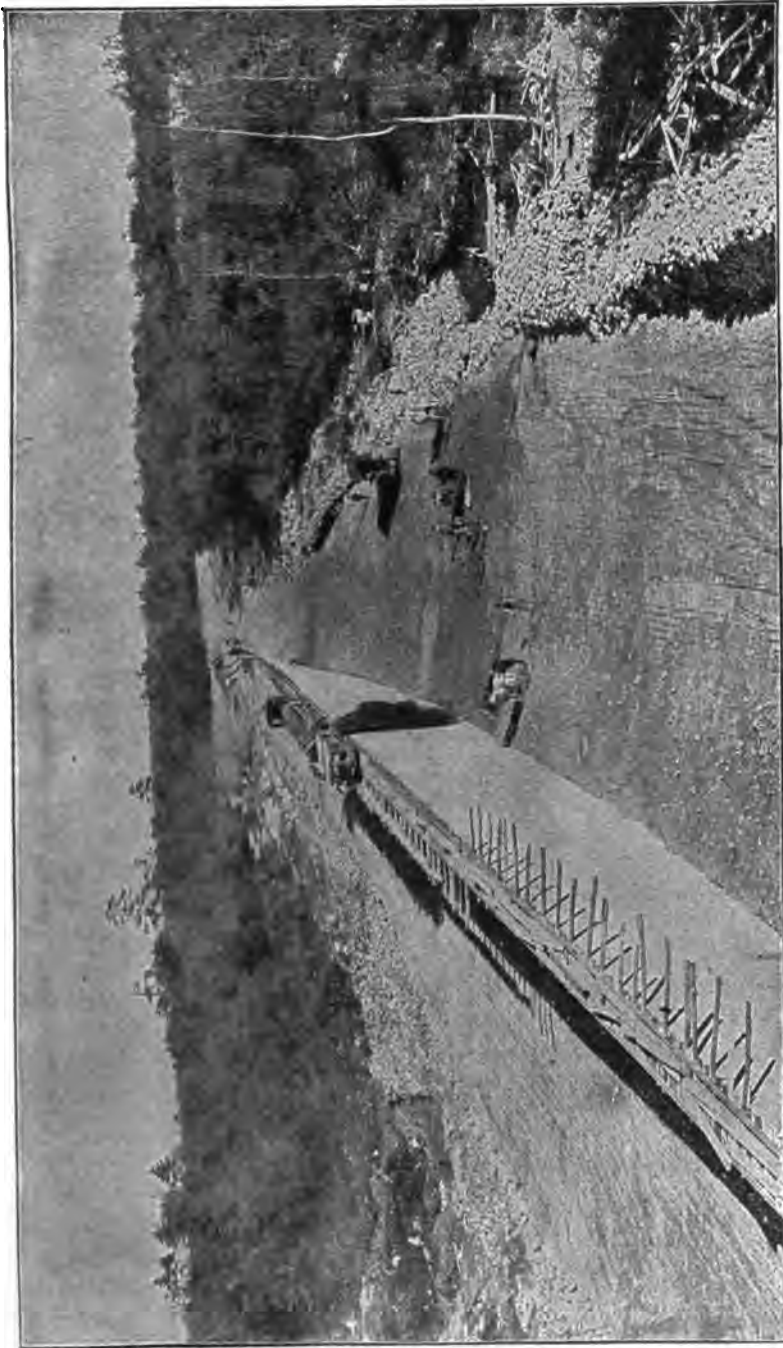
Ashokan Reservoir. Woodstock Dike, Closing Gap at East End of Basin. Train on Core Wall Dumping Embankment Material.
